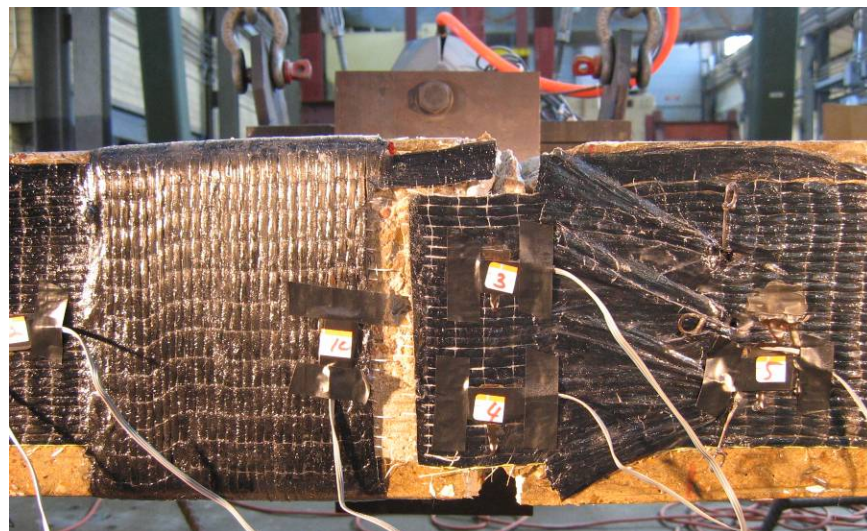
Failure of A-BF-A/U-6G, fracture of CFRP sheet
